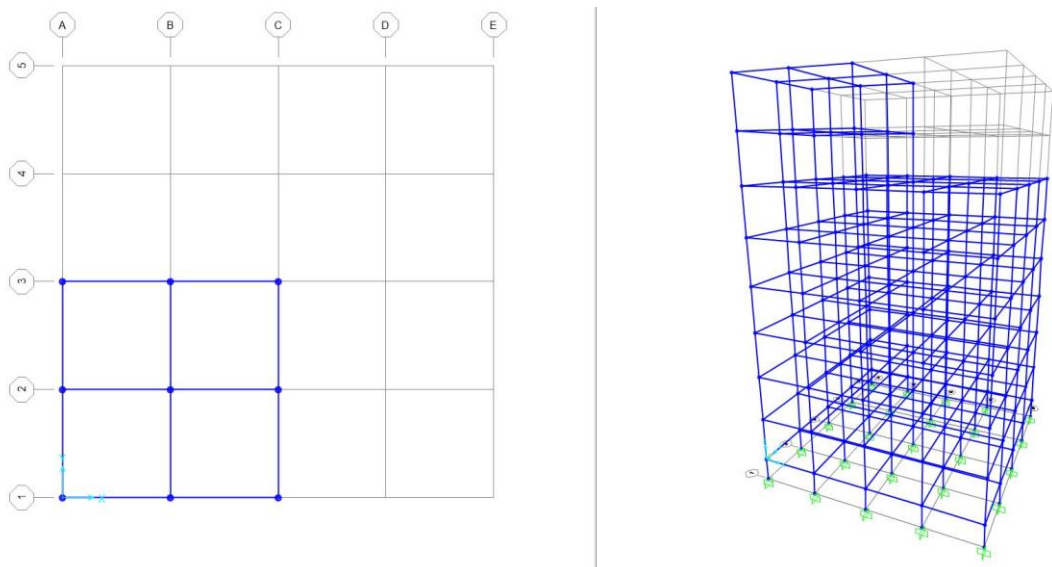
8- storey bidirectional setback building's plan and elevation
